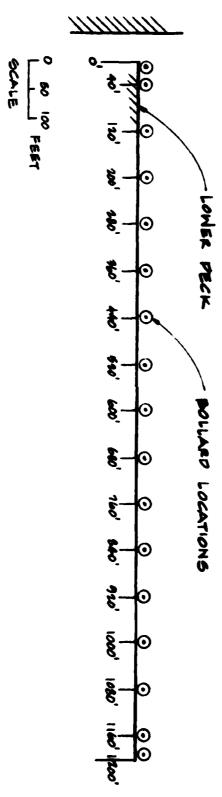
PIER BOLLARD AND BROW LOCATIONS
